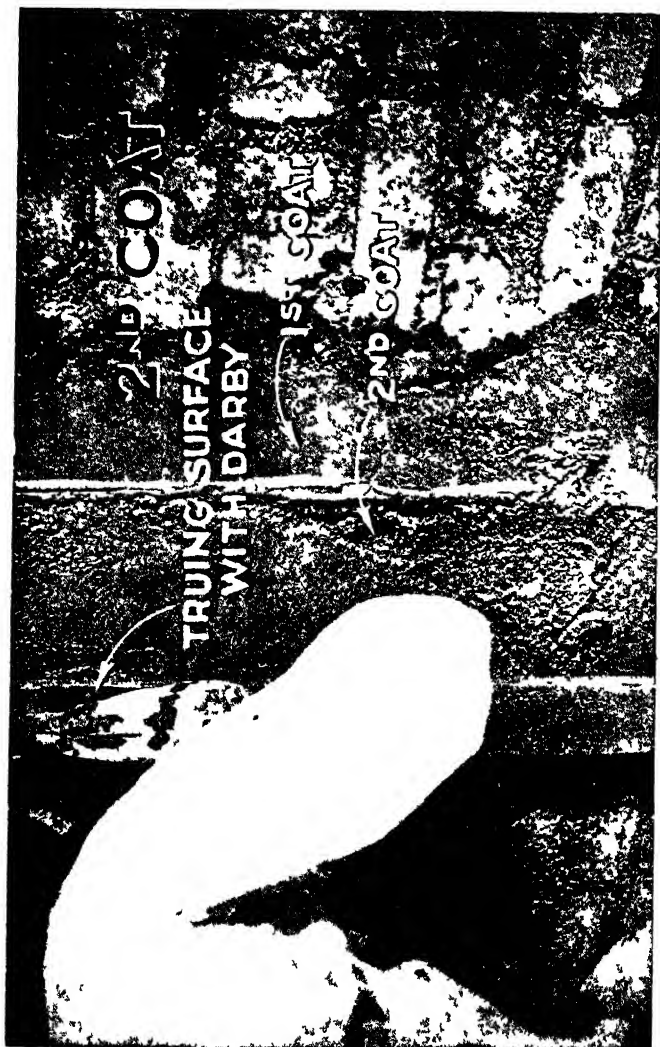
530 —Plastering on brick wall 2nd coat showing handling of darby
